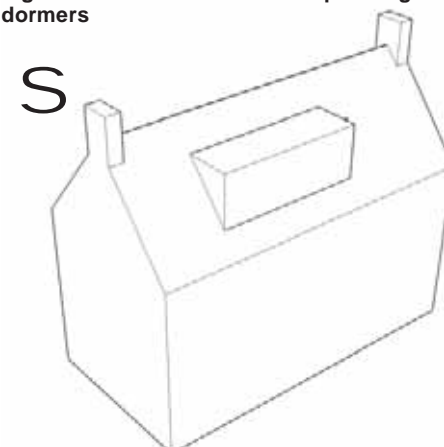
large flat roofed single dormer out of scale with the original dwelling
